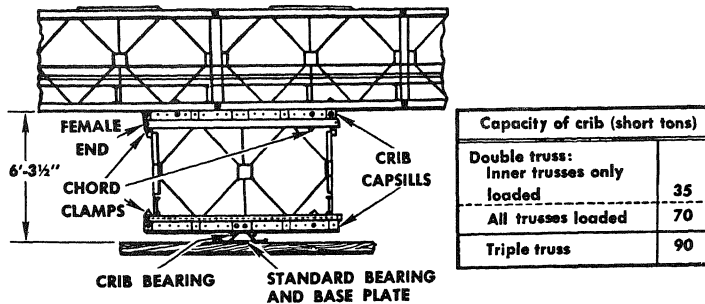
Single-story single-bay crib with panels horizontal. Continuous bridge with rocker bearing at base of crib using standard bearings.
